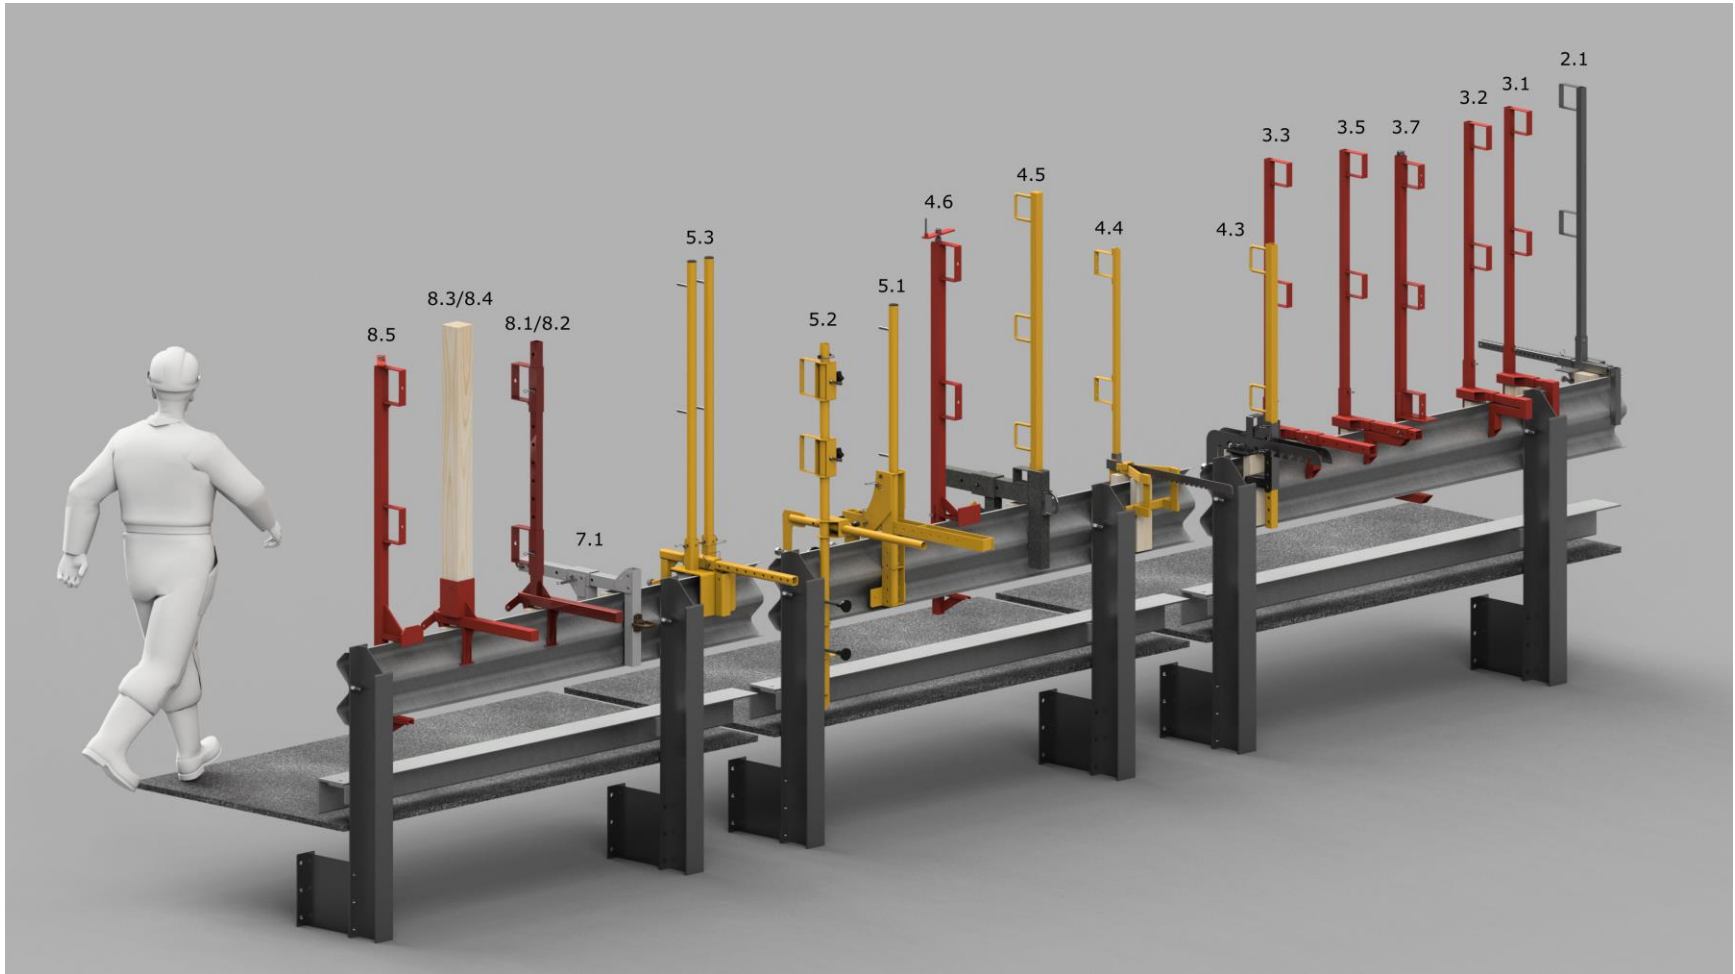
Guardrail Type 23, guardrail fit; view from the northwest
